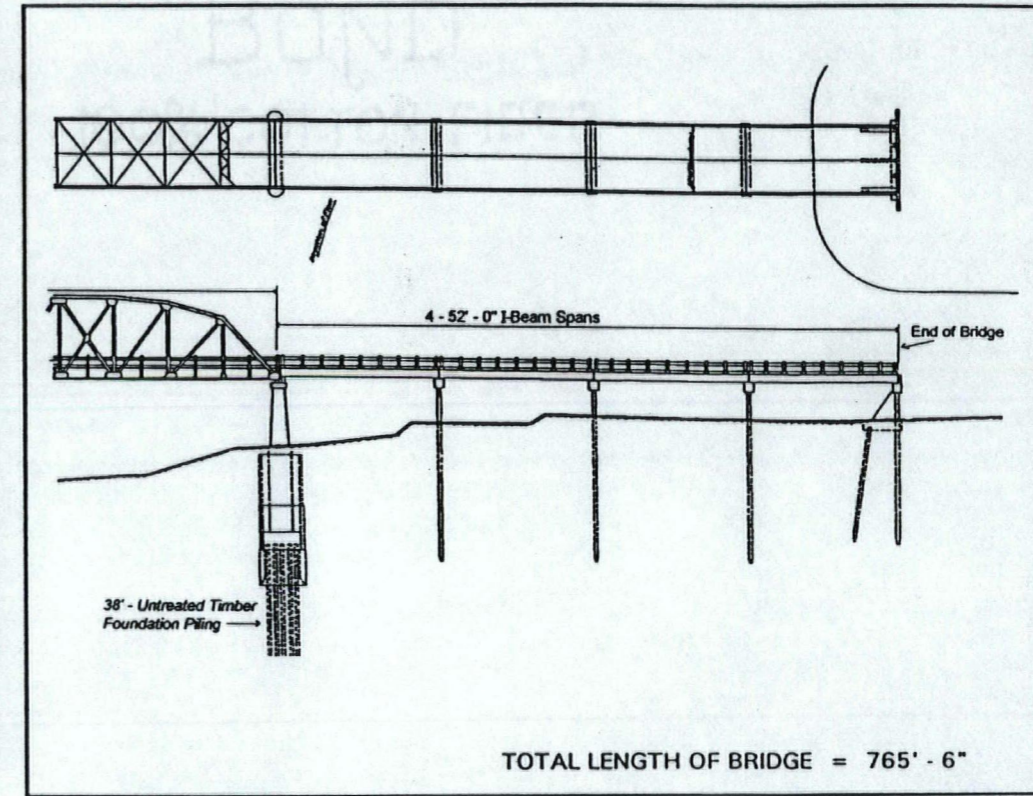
Elevation of the State Highway 3 Bridge at the Colorado River as shown in the 1931 plans.
